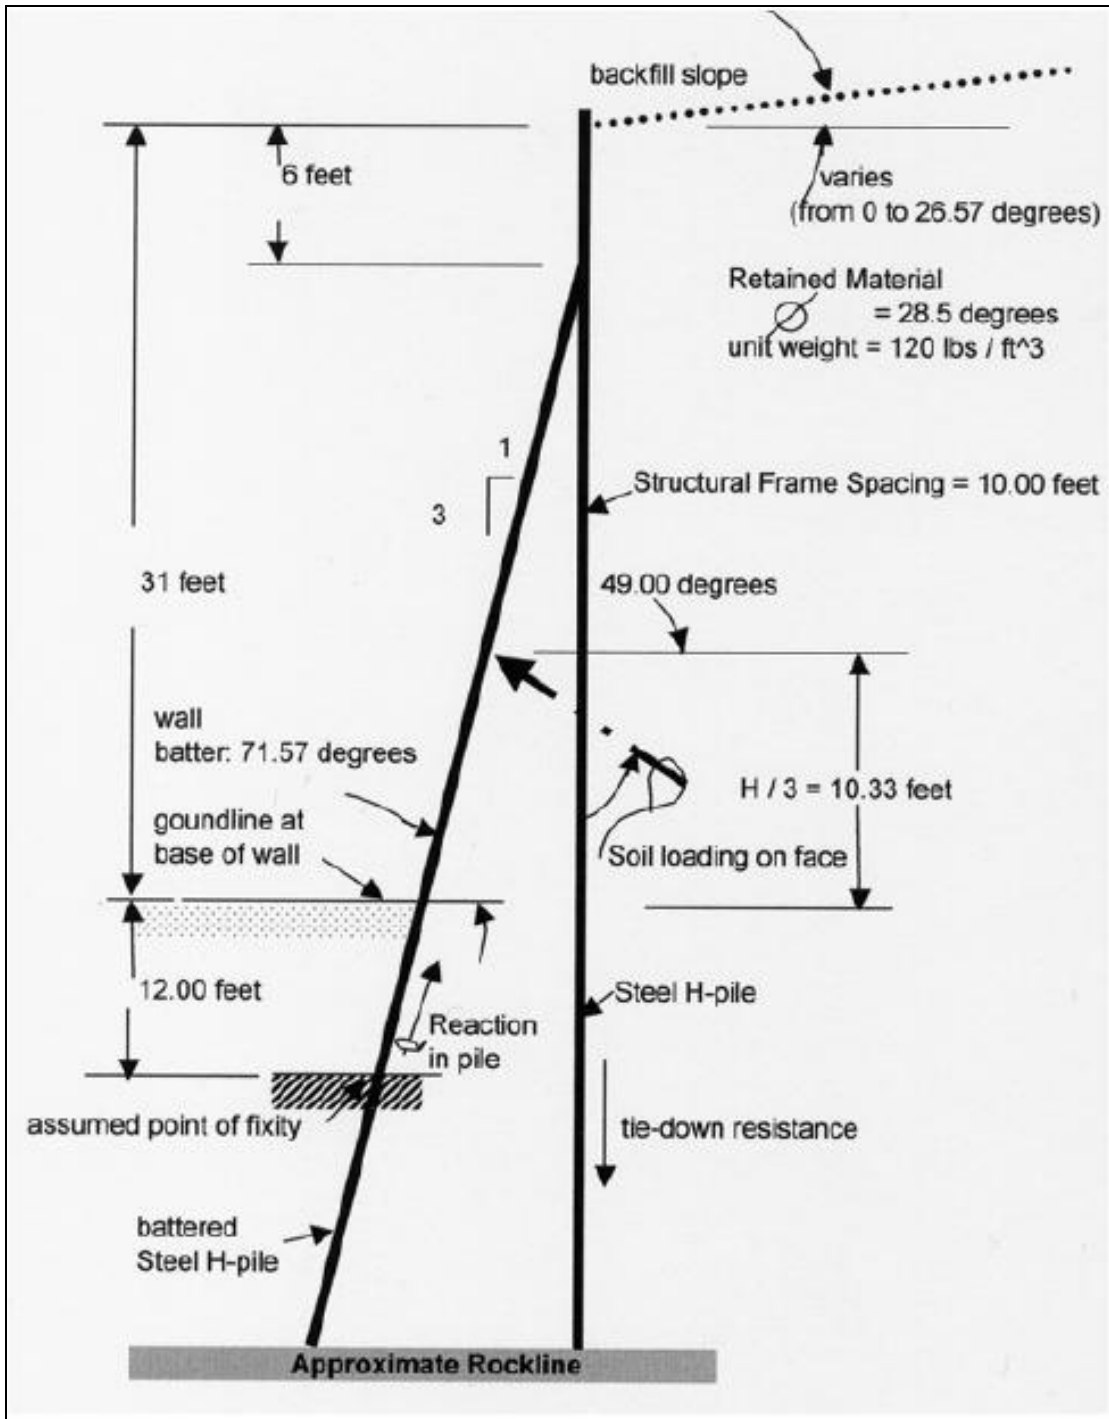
Representative Section of West Hills Wall (Pate and Haddad, 2007)
